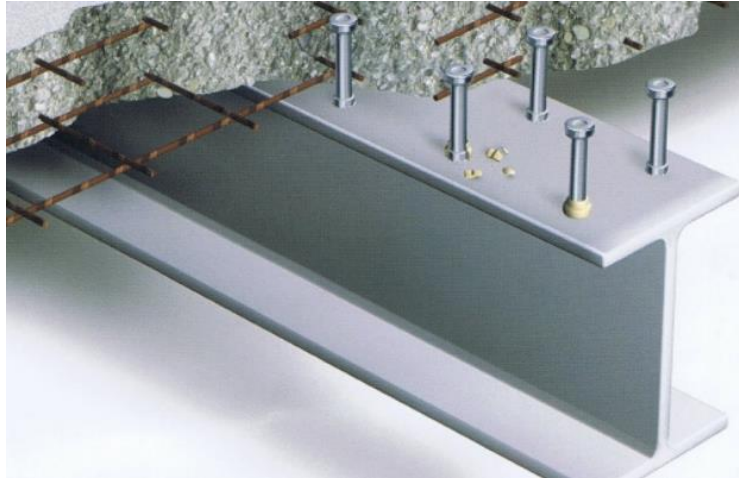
Instance of Arc Stud Welding Application in Bridge Building
